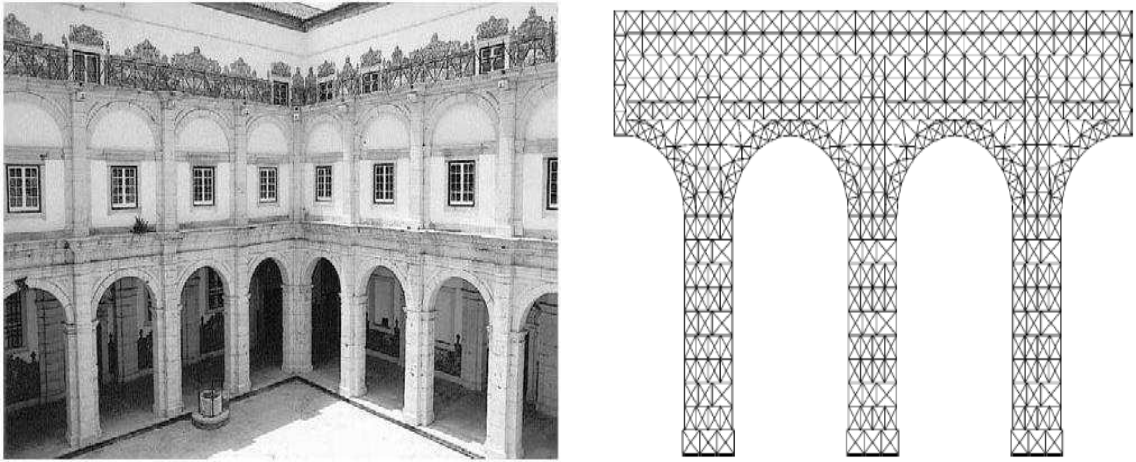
(a) Masonry building: Cloister Façade; (b) DEM internal finite element mesh of the lower part of the building (Giordano et al., 2002)
